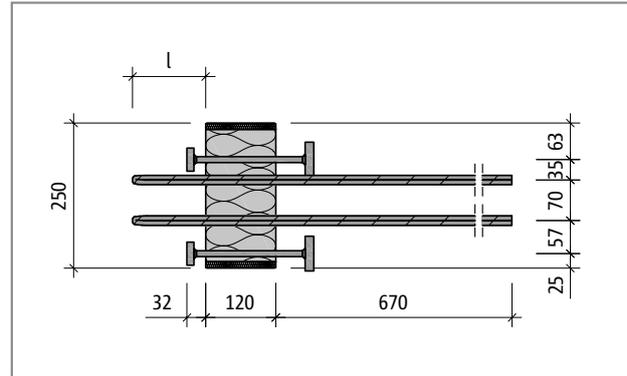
Schöck Isokorb® XT type O: Product plan view
